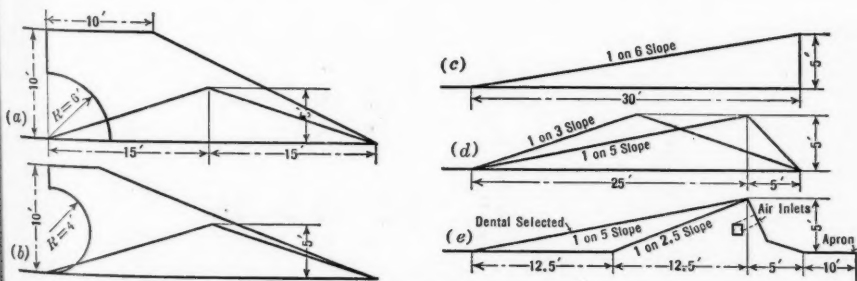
TYPICAL DENTALS TESTED WITH MODEL SPILLWAY, BULL RUN DAM.
